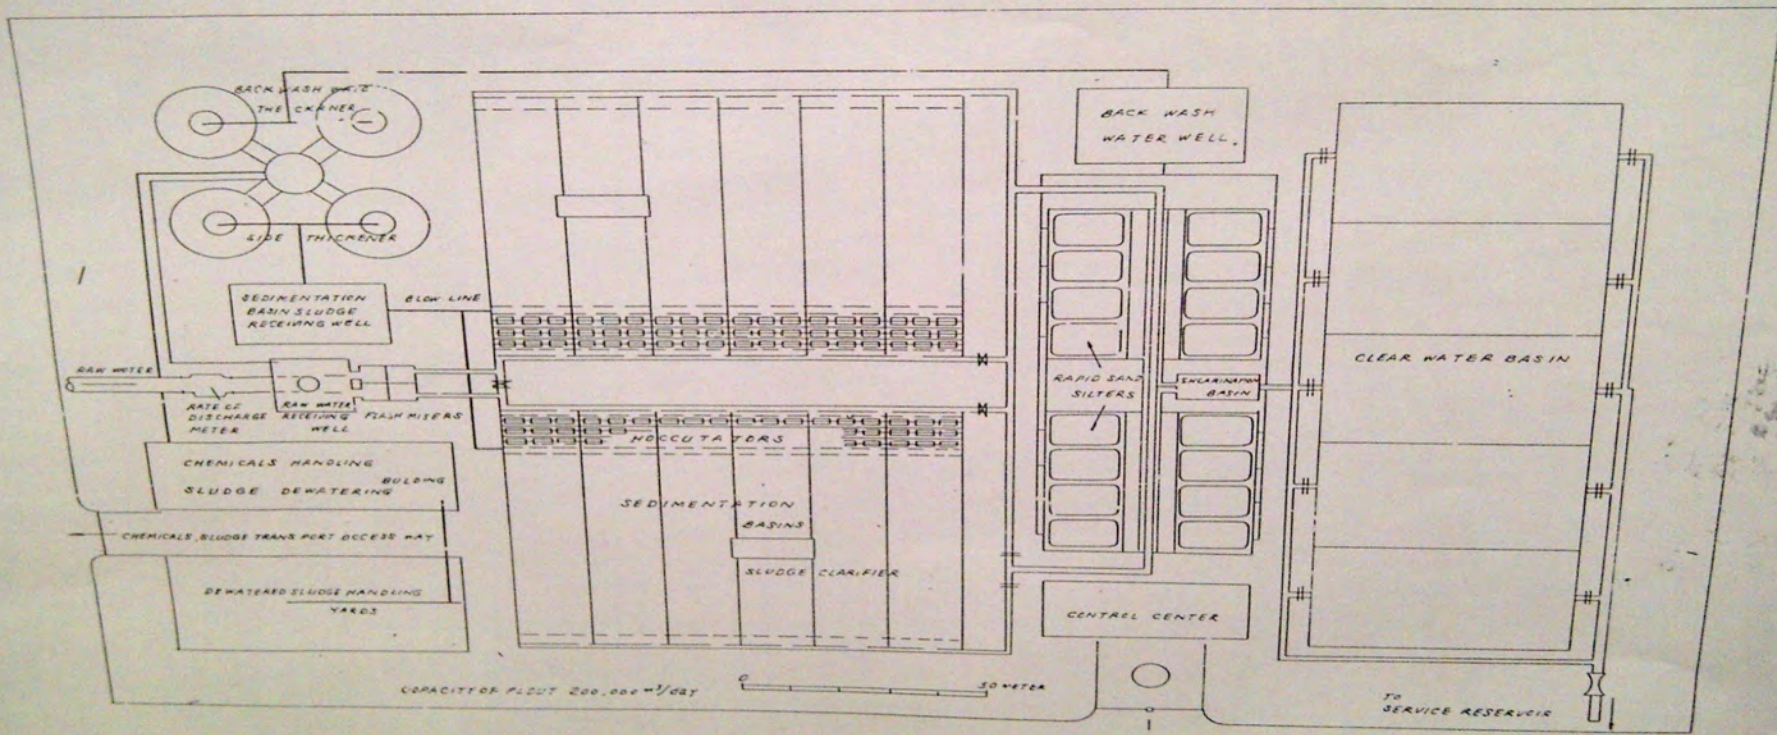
Plan of A Rapid Sand Filtration Plant
